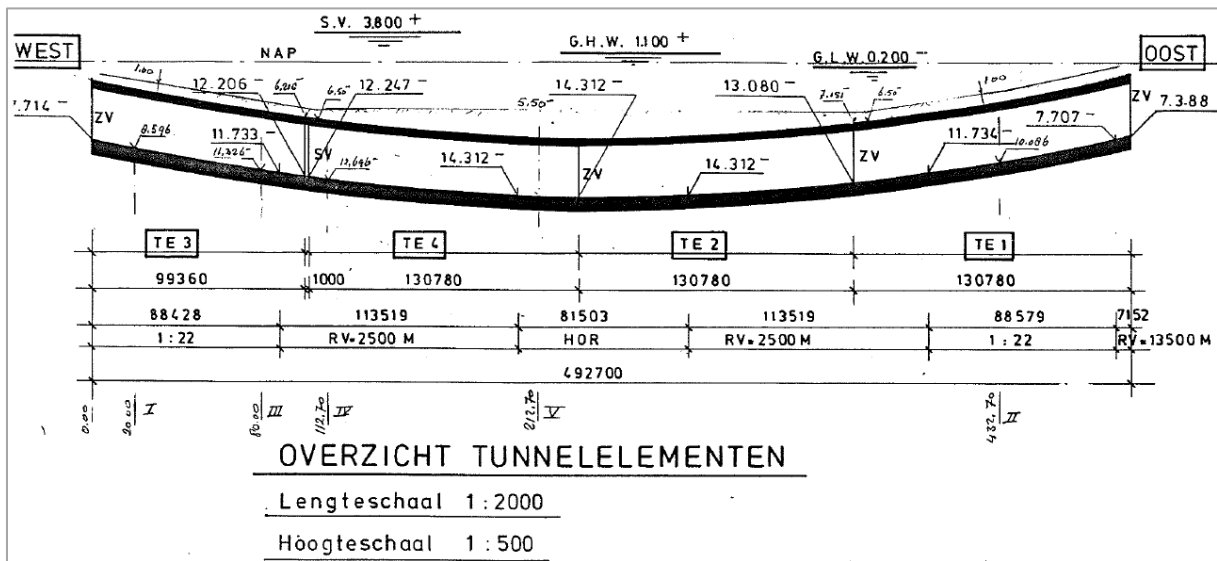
Longitudinal section of the Noordtunnel (TEC, 1989).
